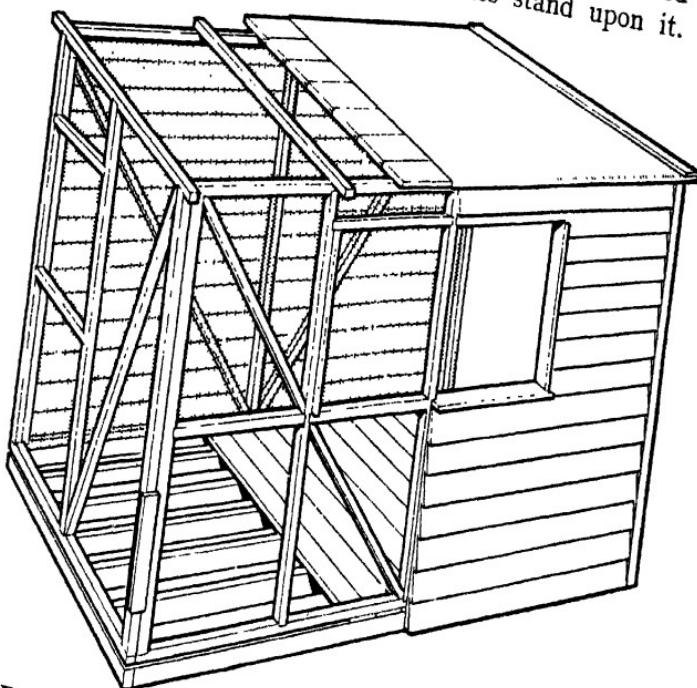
CUT-AWAY VIEW SHOWING GENERAL CONSTRUCTION.
